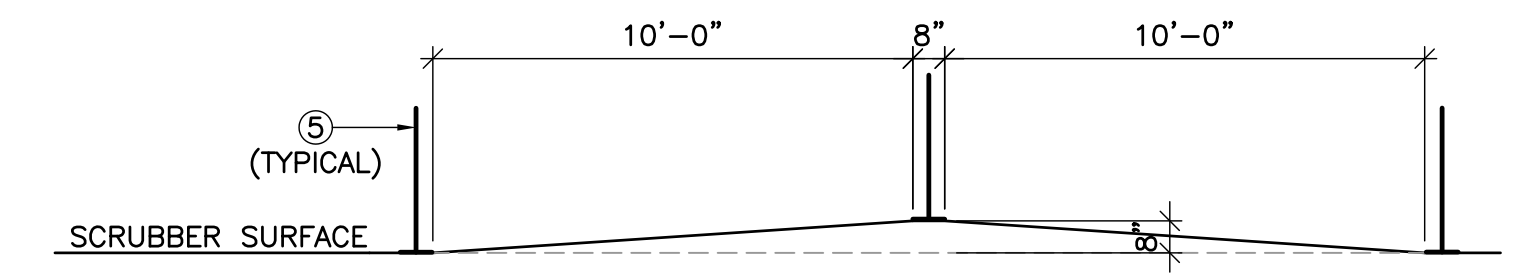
DETAIL: WORK SLAB LAYOUT PLAN VIEW
